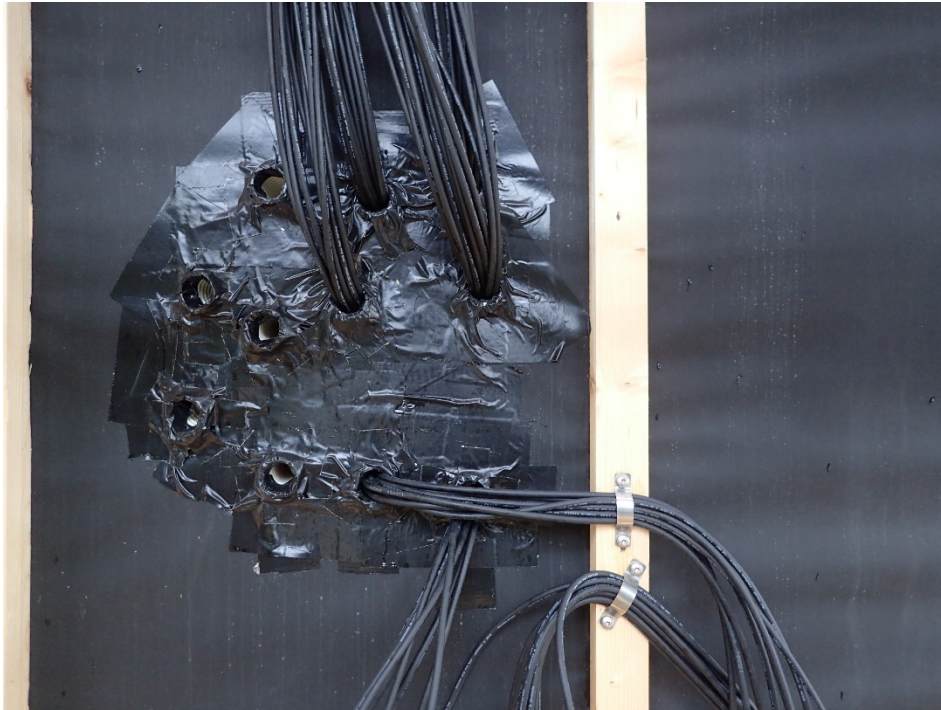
Substantial use of tape to make a seal around cables penetrating the wind barrier.
